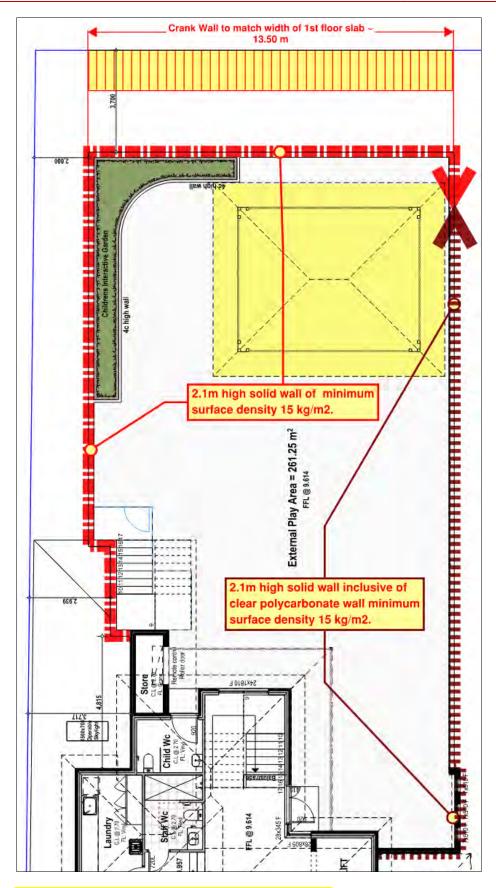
FIRST FLOOR NORTH - Noise Barriers
